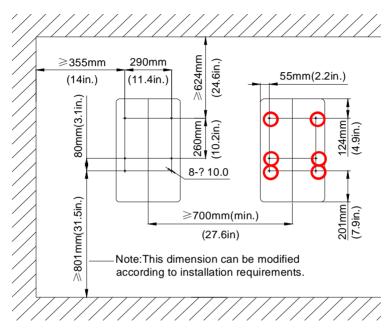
Dimensions of the bracket anchoring holes for mounting
